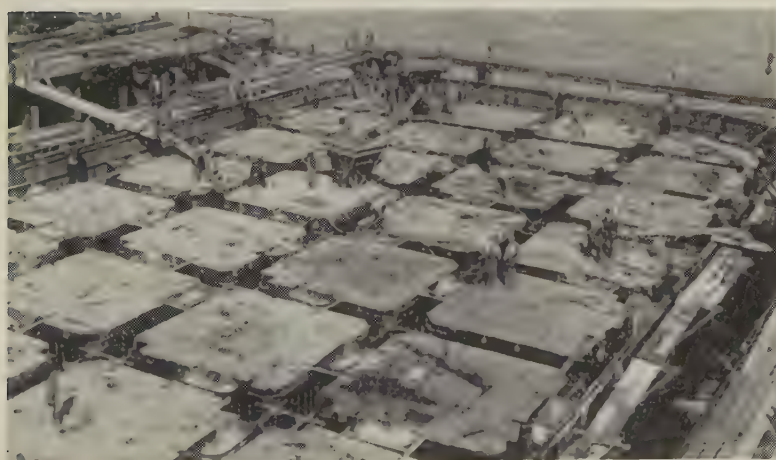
DIGGING WELLS COVERED WHILE BUILDING UP—NOTE TRAYS FOR CROSS-WALL PLACING WITH VIBRATOR CONCRETE
